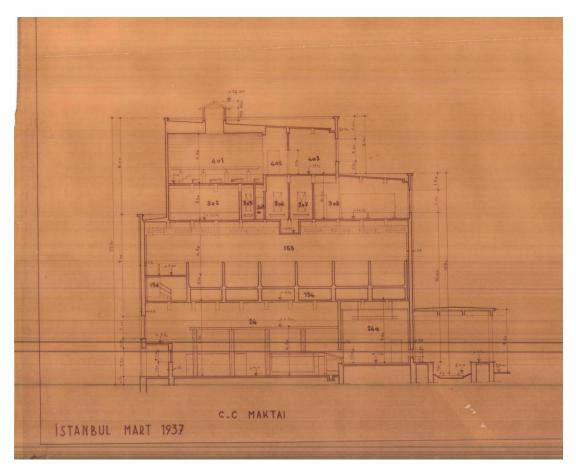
Original drawing of the boiling and fermentation building, C-C Section, Ernst Egli, 1937 (Source: TTA Archive)
